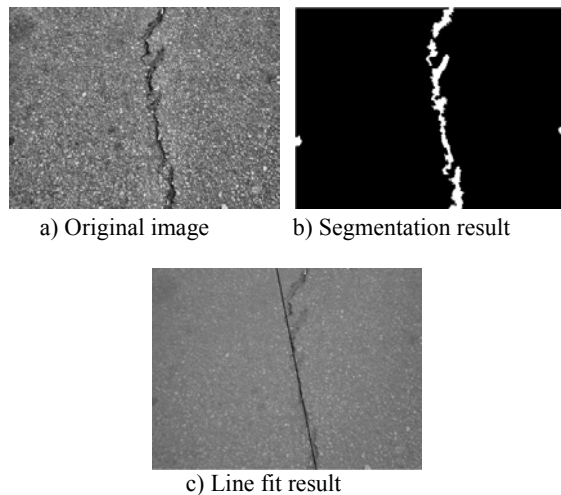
Pavement surface image with a longitudinal crack
